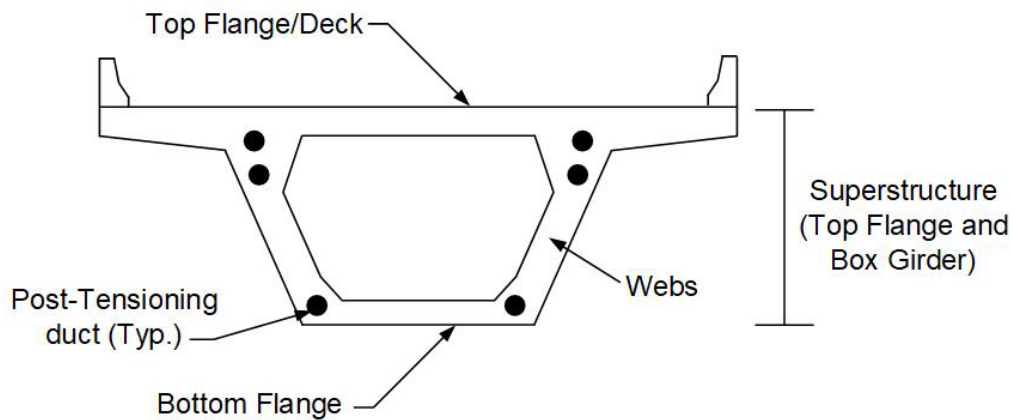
Basic Members of a Single Cell Concrete Box Girder
